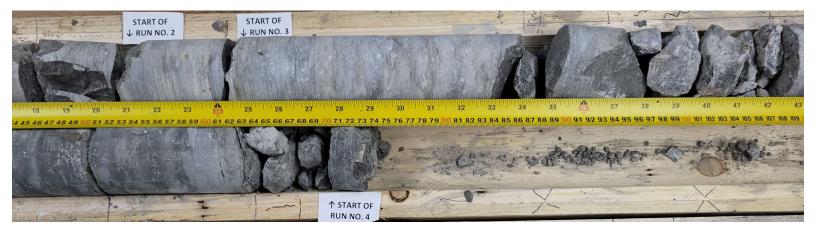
BH201 – Box 1 (Photo 2 of 3) – Run Nos. 1 - 4
